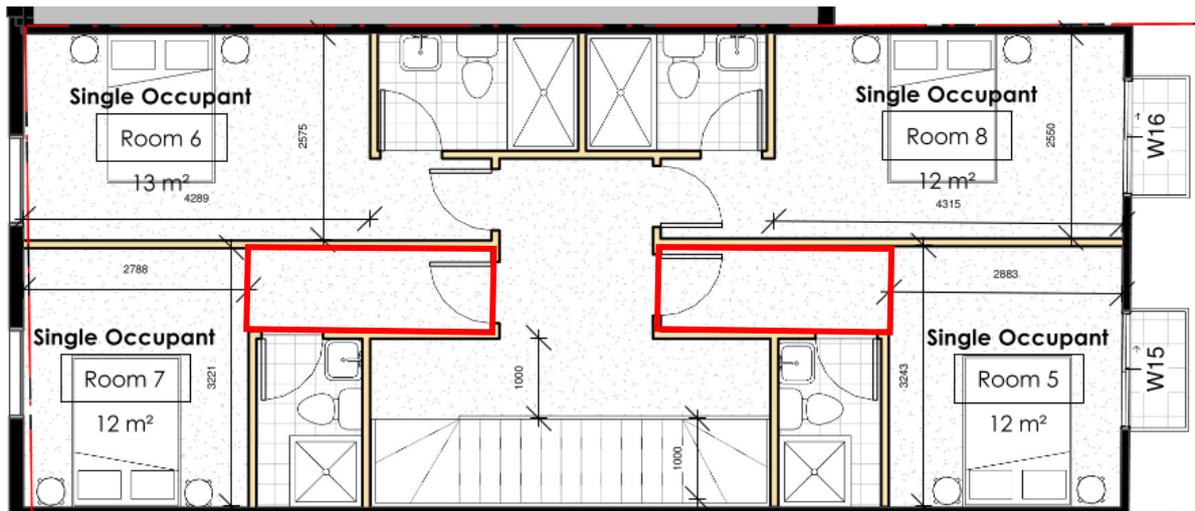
Second level floor plan detailing the non-functional hallway area (in red) of the boarding rooms.
